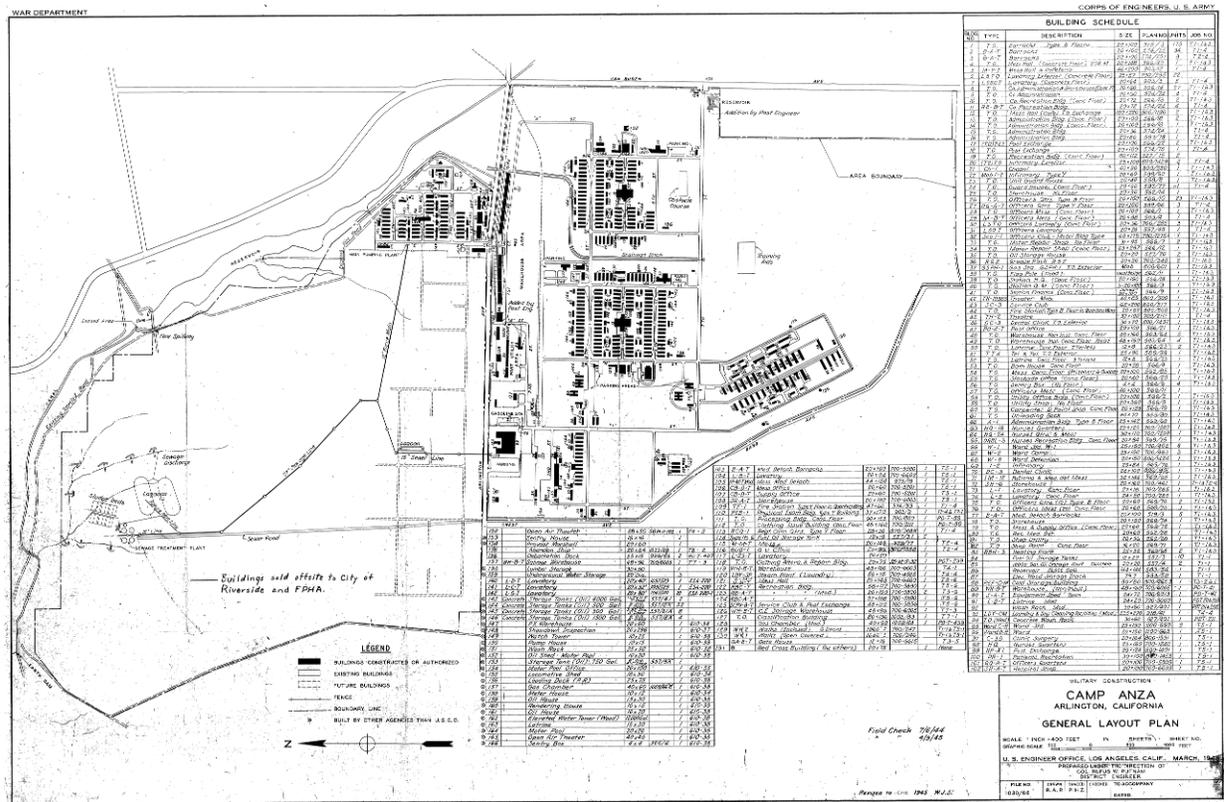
Camp Anza General Layout Plan (1944; NARA n.d.:5)
